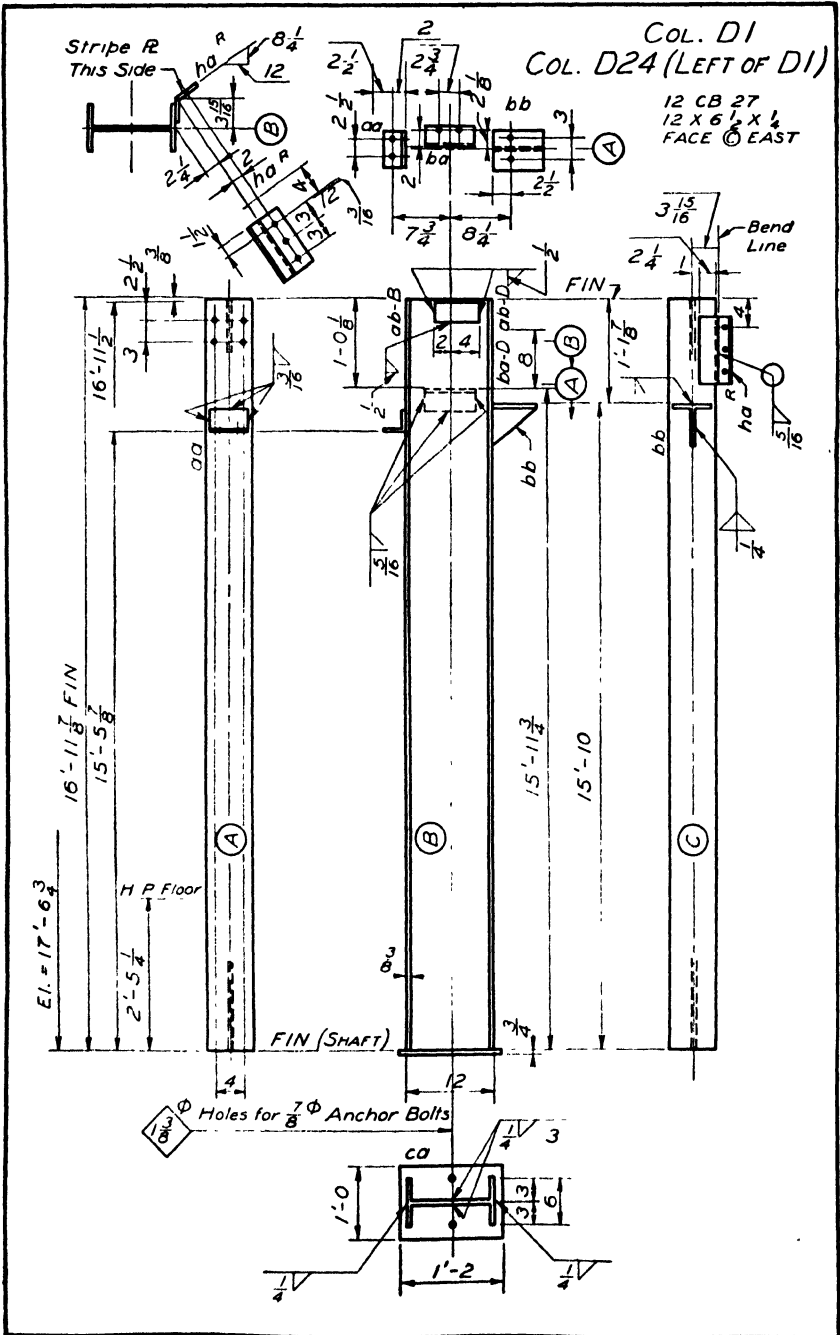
Welding symbols on a structural drawing. Prob. 431. (American Bridge Company.)
